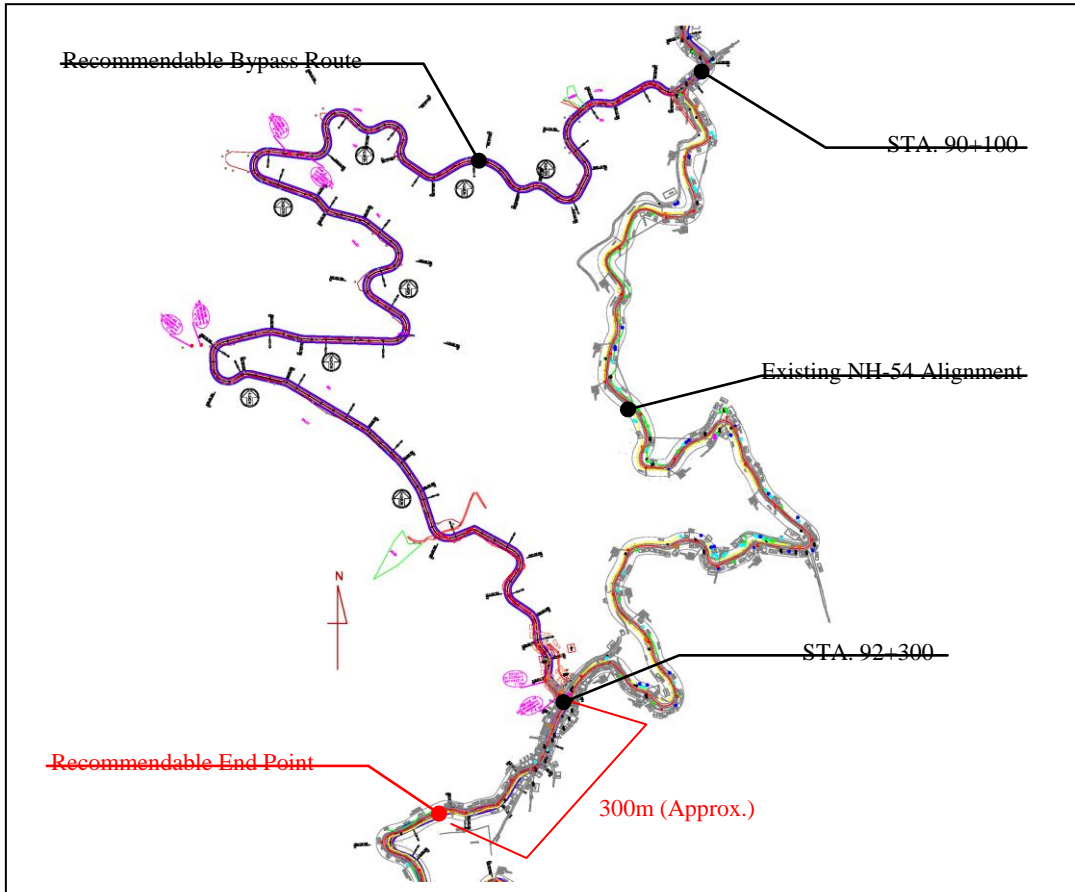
X Recommendable Chhiahtlang Bypass Route
